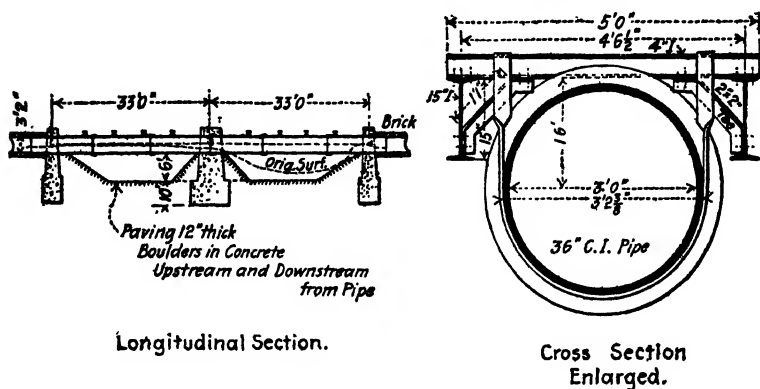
Sewer bridge, joint outlet sewer, New Jersey.
